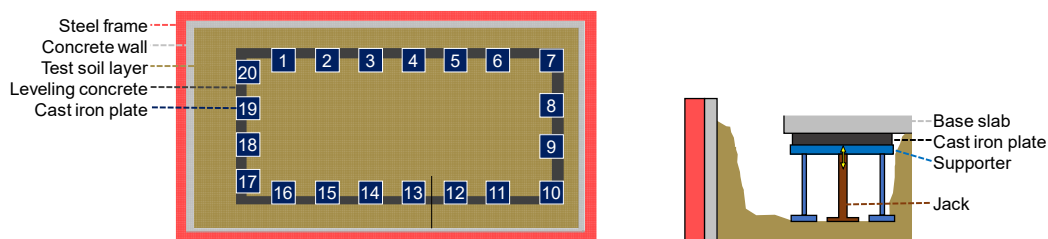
Locations of twenty cast-iron plates in the foundation plan and the installation procedure
